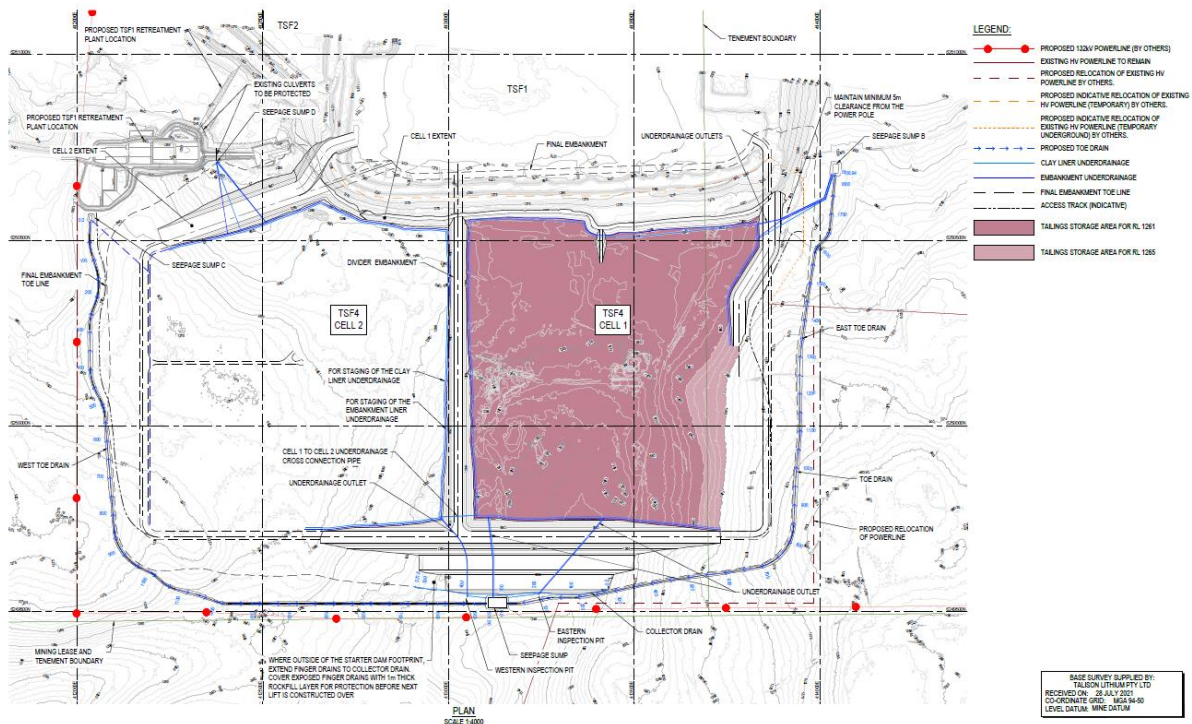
Tailings Storage Facility 4 Cell 1a (RL 1261 m)
